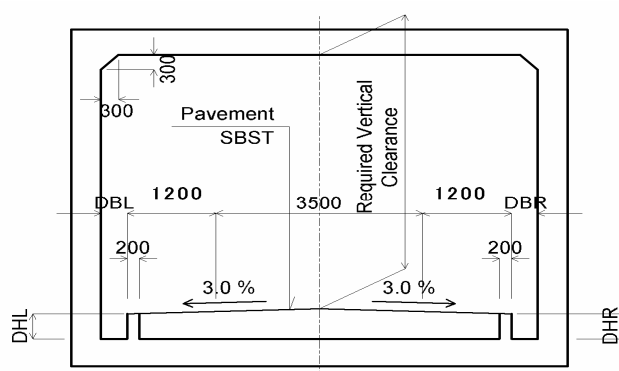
Detail of Box Culvert Internal Clearance for Class-E Road
